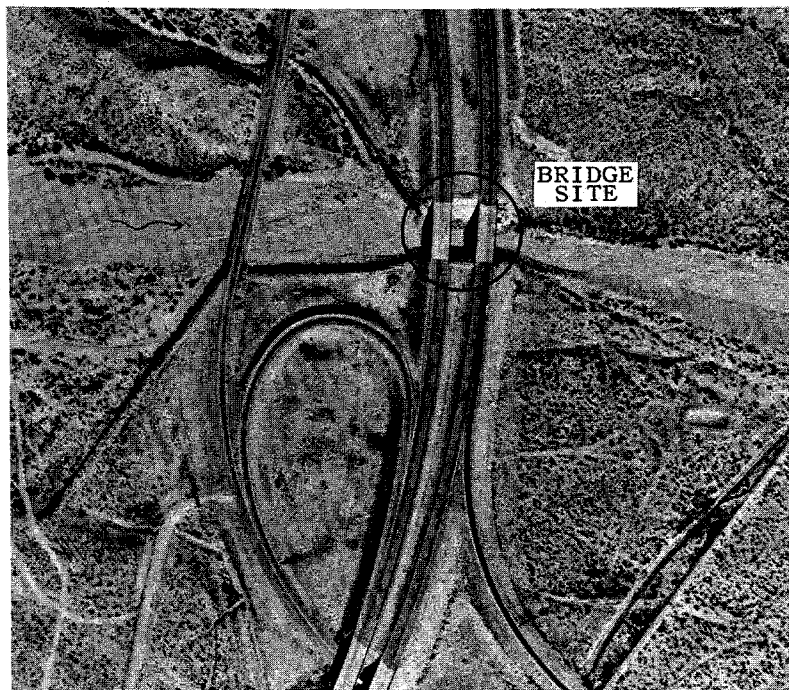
Aerial photograph taken in 1973 of Walnut Creek at I-25 near San Antonio, New Mexico. (From New Mexico Dept. of Highways.)
